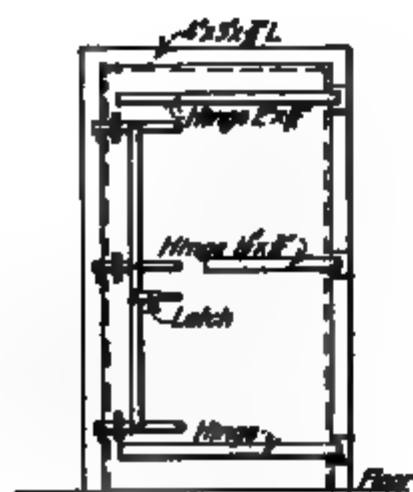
Details for steel doors for boiler room, coal rooms, and warehouse stair shafts.
